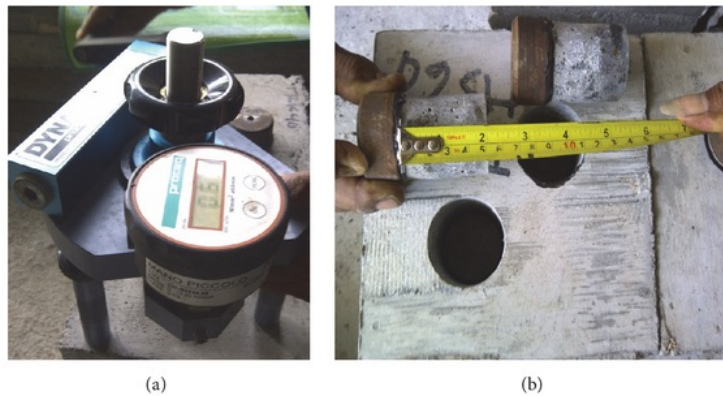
(a) Direct pull-off test setting and (b) typical failure on concrete interface.
